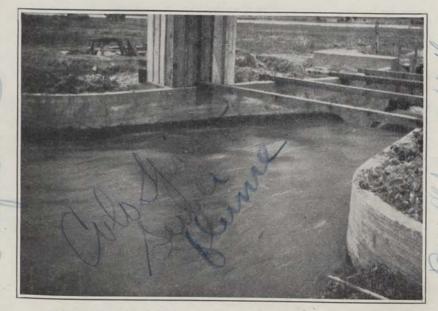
Ten-foot Reinforced Concrete Improved Venturi Flume Discharging 200 Second-feet. Dye Lake Outlet, near Rocky Ford, Colorado.
